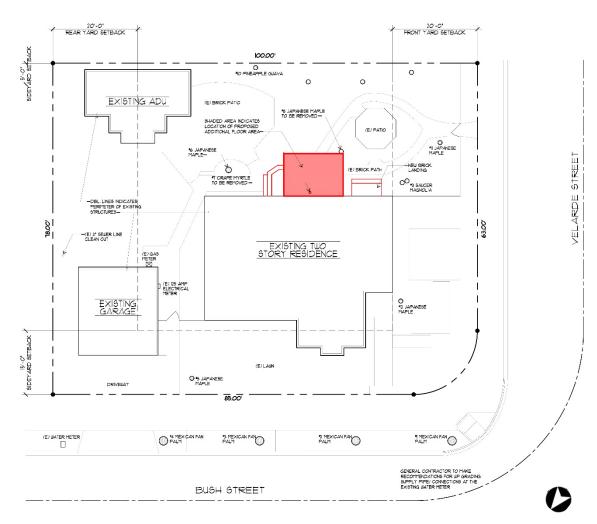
Proposed site plan. Rear addition and alterations indicated by red shading and outline. Source: "Proposed Remodel For: The Bettman Residence" prepared by Flury Bryant Design Group, Inc. (dated July 16, 2024), Sheet 2. Edited by Page & Turnbull.
